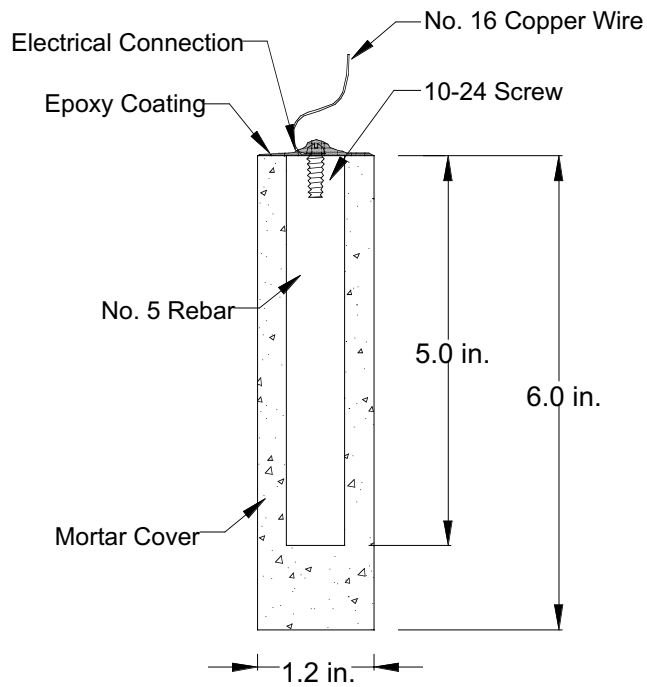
Cross-Section of Mortar-wrapped Test Specimen Used for Rapid Corrosion Macrocell Test
